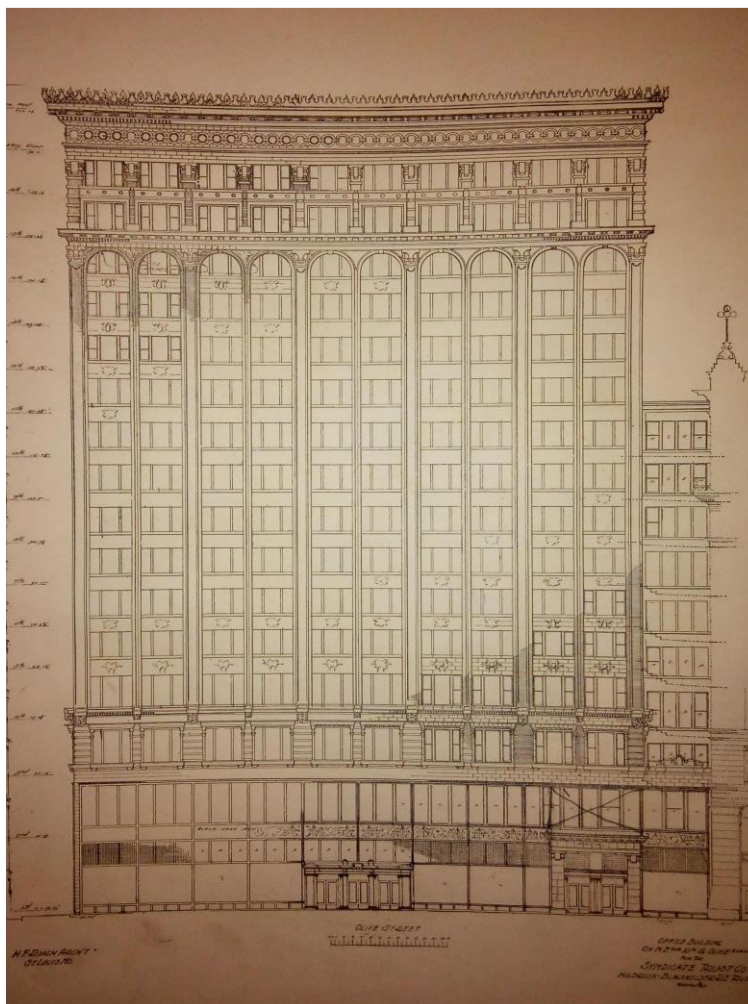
Floor elevation of the building (Original building drawing provided by KPFF)
